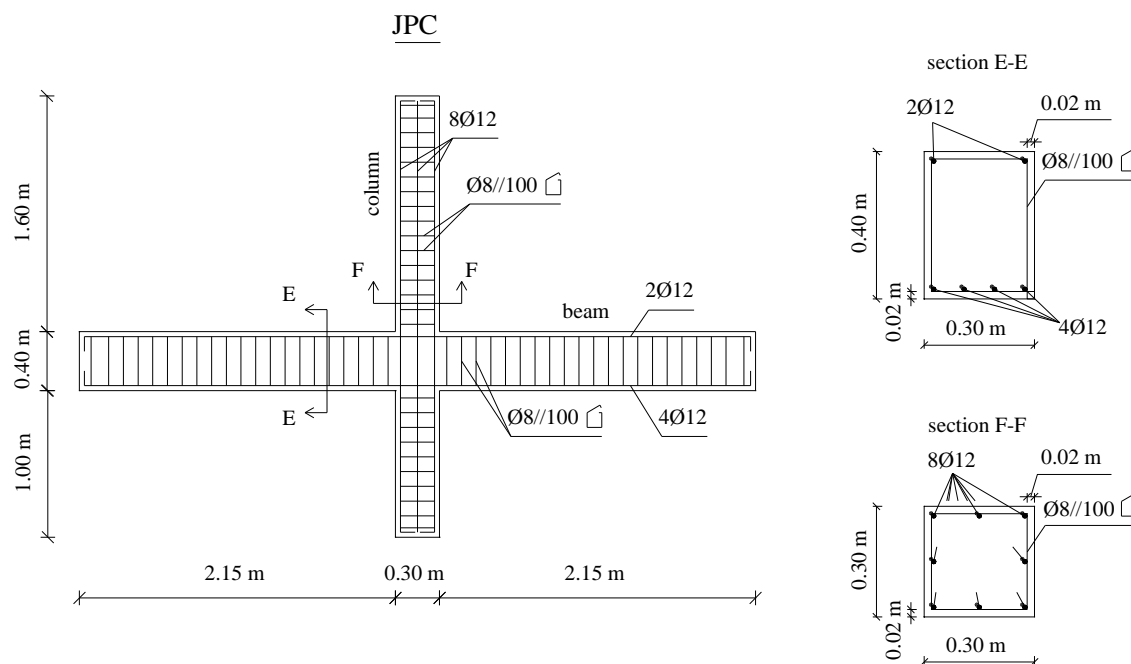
Dimensions and reinforcement detailing of specimen JPC.
